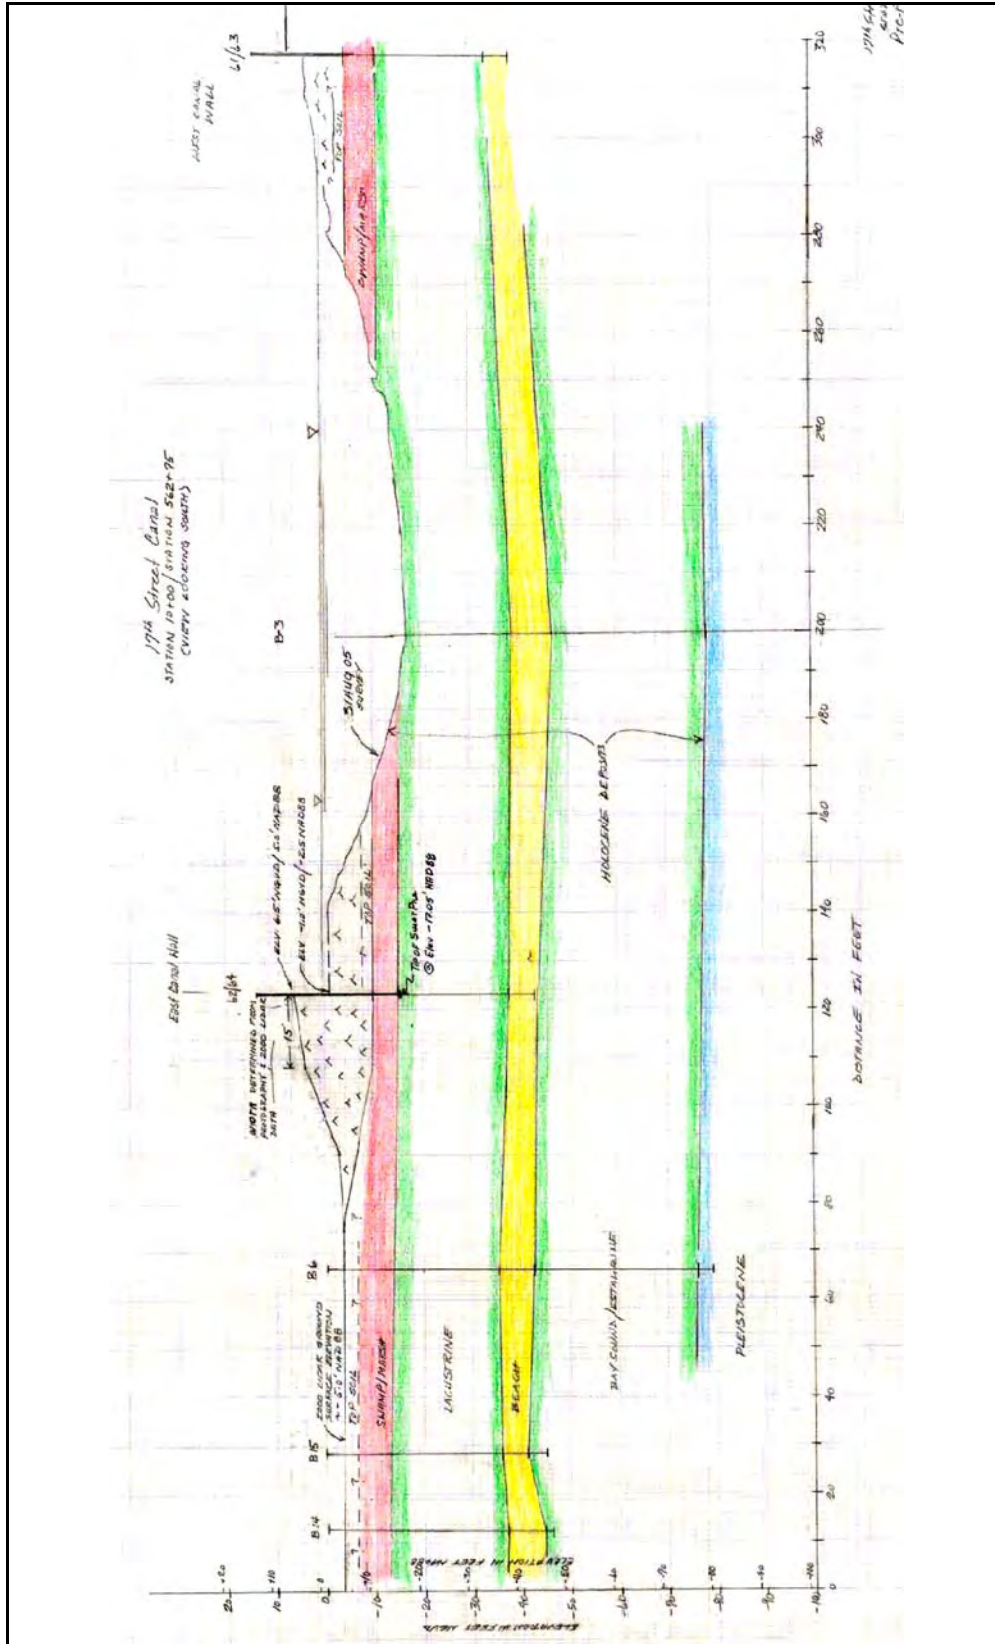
Prefailure Cross-Section at Sta 10+00 (New Stationing)/ Sta. 562+75 (GDM Stationing)
